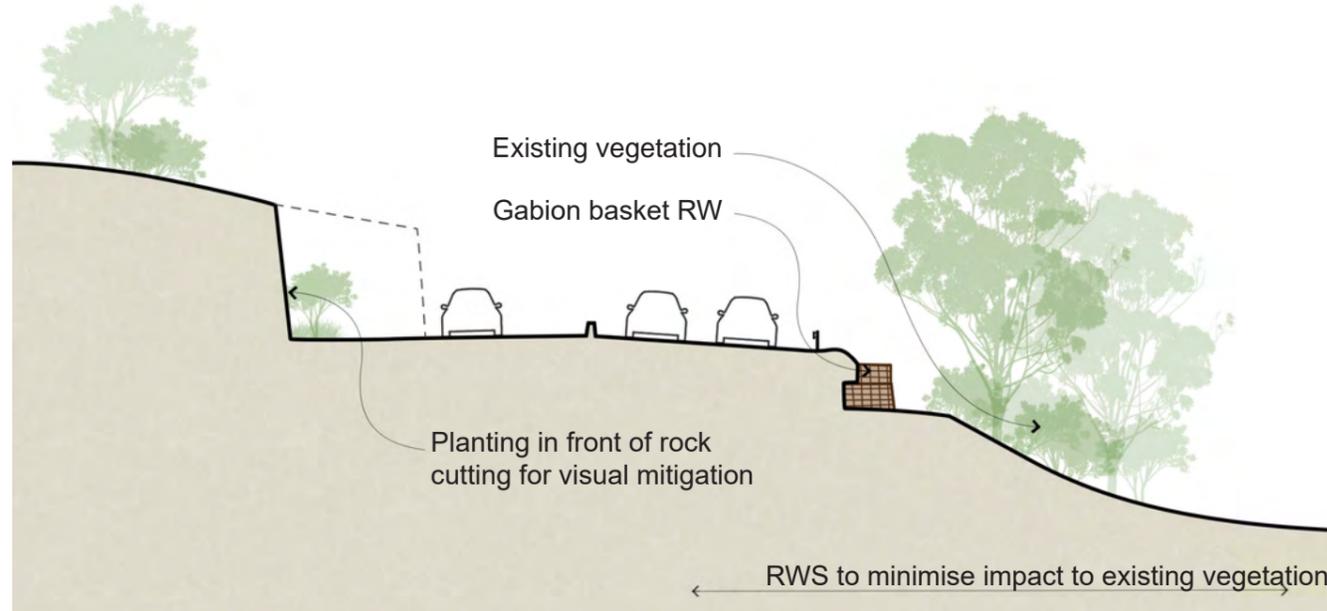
Planting in front of high rock cuttings and use of retaining walls to minimise earthworks to maximise retention of existing vegetation
